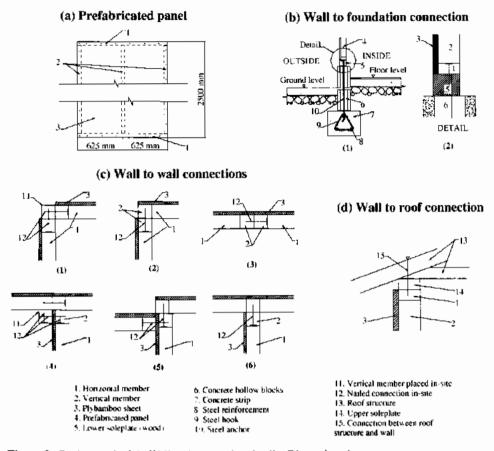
Design method A. Wall and connection details. Dimensions in mm.
